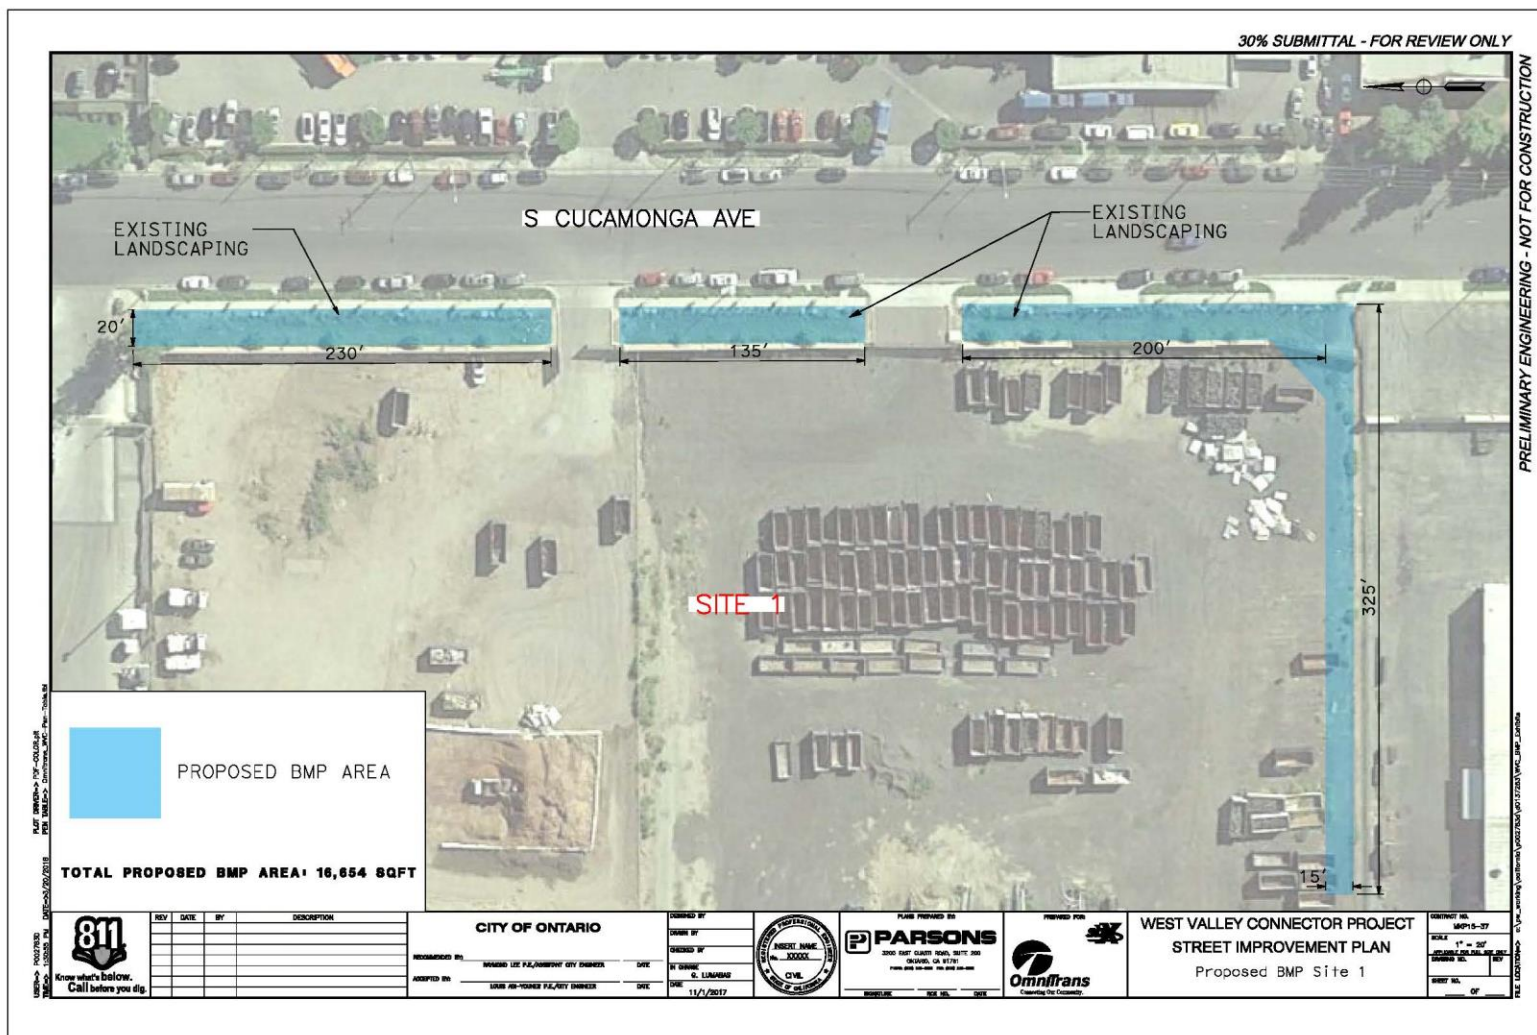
Proposed BMP Area for O&M Facility Site 1
